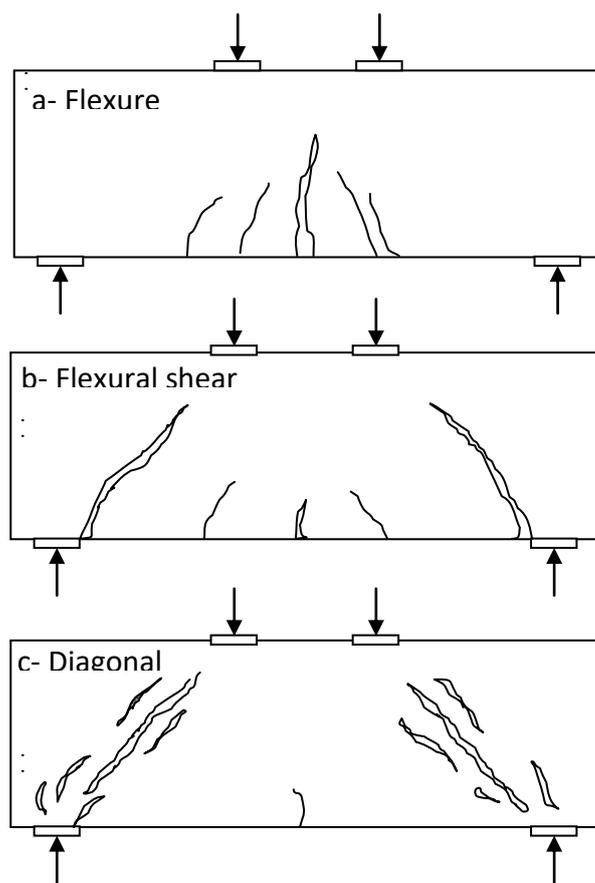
Modes of Failure of Single-Span Reinforced Concrete Deep Beams [4].
